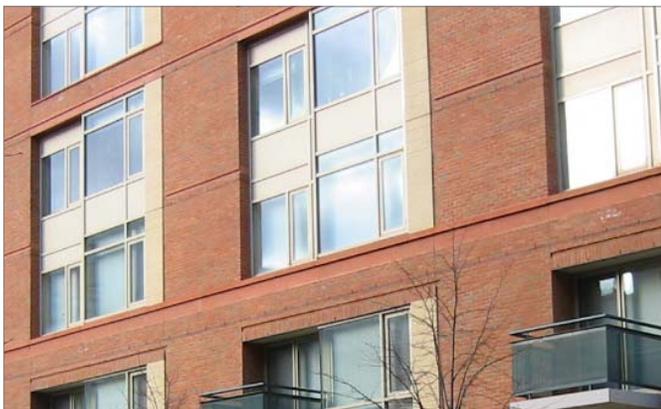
This project inserts a curtain wall system within a punched opening. The red brick wall turns to reveal the wall's thickness, and the curtain wall is placed at varying depths within the apparent thickness of the brick wall opening.
